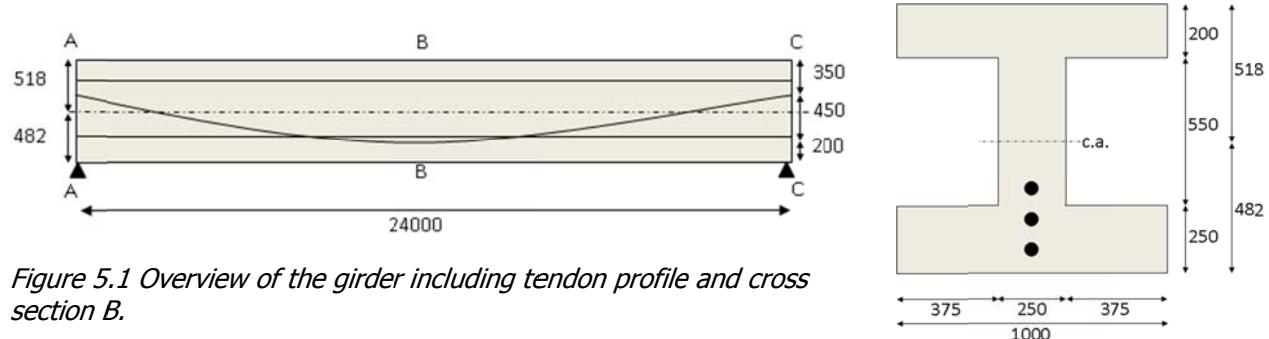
Overview of the girder including tendon profile and cross section B.
